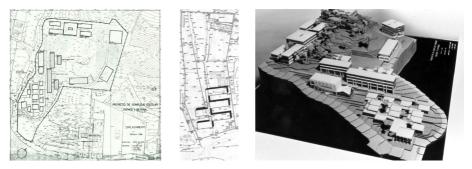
Design plan of the school, first distribution (1963). Figure 6: Design plan of the nursery distribution (1965). Source: Historic Archive Col·legi Oficial d'Arquitectes COAC, Giráldez, López-Íñigo, Subías Collection. Figure 7: Model of the school, first distribution. Source: COAC. Fons Francesc Català Roca (1963).
